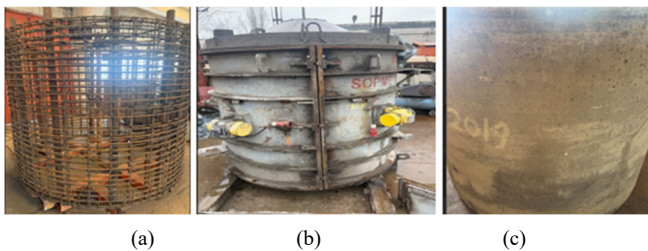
Product made by sustainable manufacturing process: (a) pipe frame, (b) vibration casting device, (c) manufactured product
